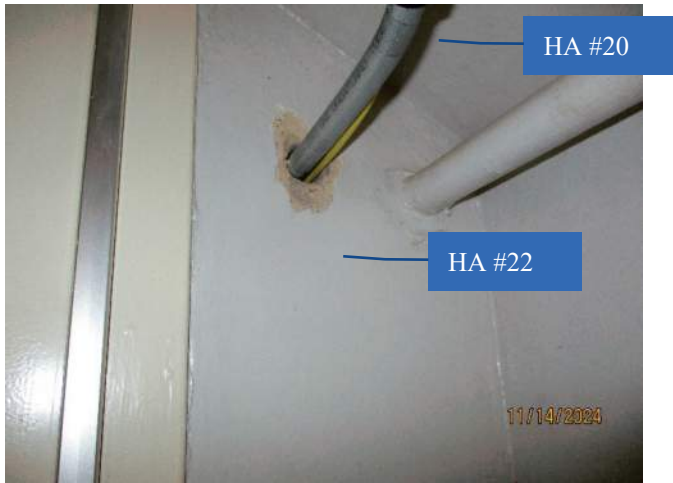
View of HA #20: Non-ACBM plaster ceiling (smooth) and HA #22: Non-ACBM plaster wall (light sand).
